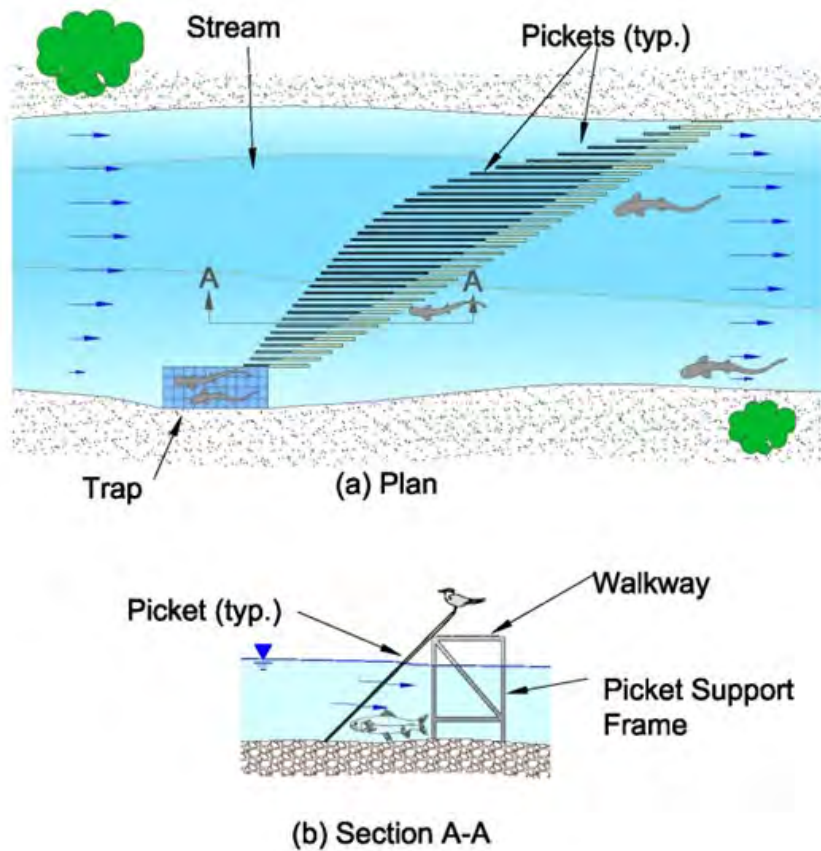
Fish weir constructed with pickets in plan (a) and section (b) views
